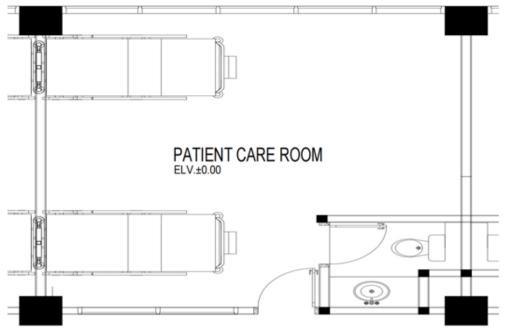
Detailed treatment room floor plan in white rose pavilion, Sidoarjo Regional Hospital
